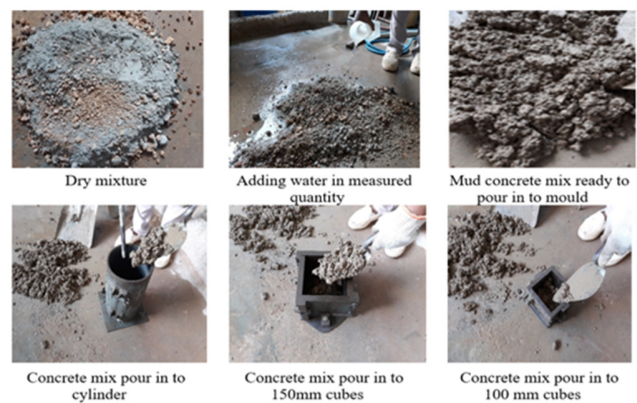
Mud concrete mixing and casting to different mould sizes and shapes
